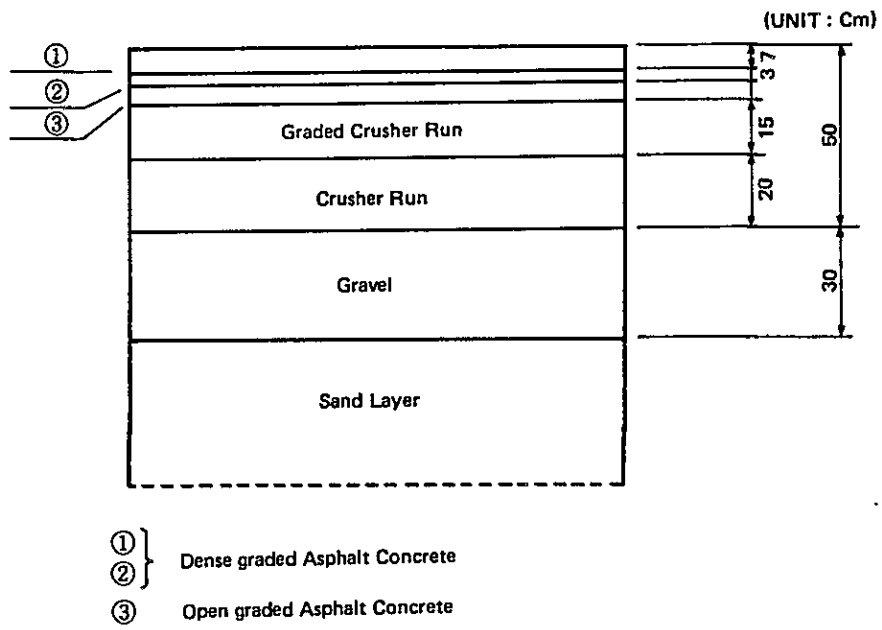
Asphalt Concrete Pavement for Container Yard
